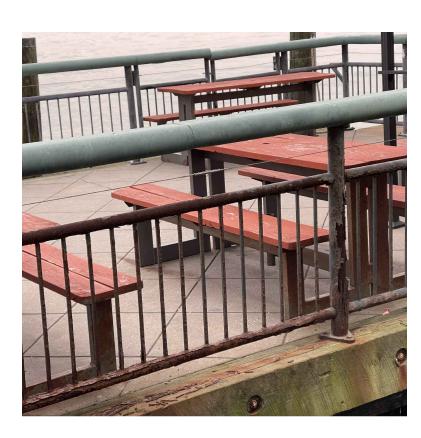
OPEN AREA #6 DETERIORATED HANDRAIL
